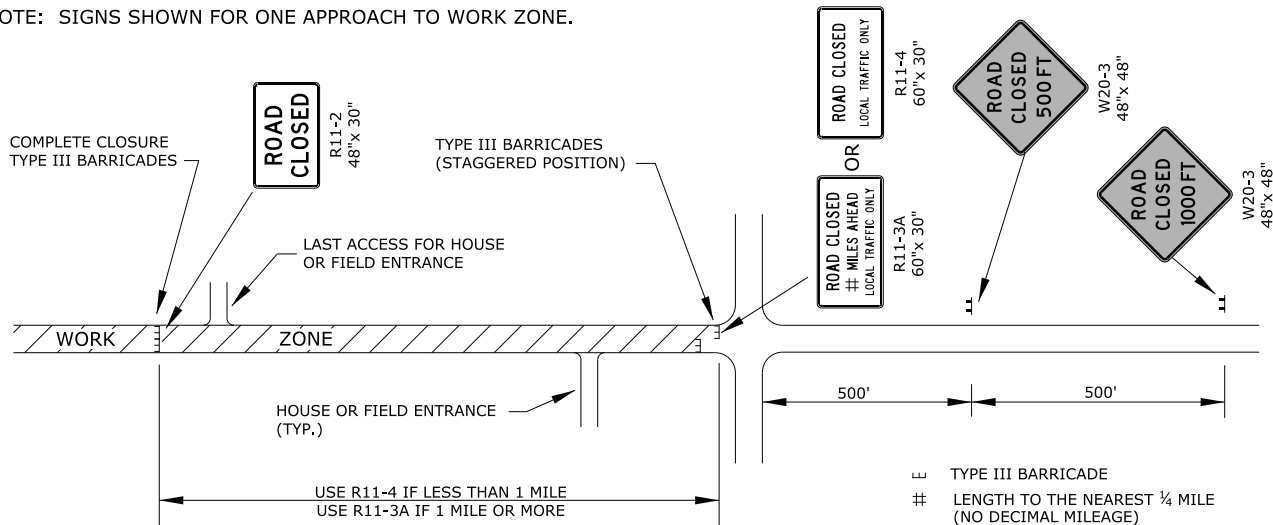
TYPICAL SIGNING FOR ROAD CLOSURE - LOCAL TRAFFIC ACCESS
